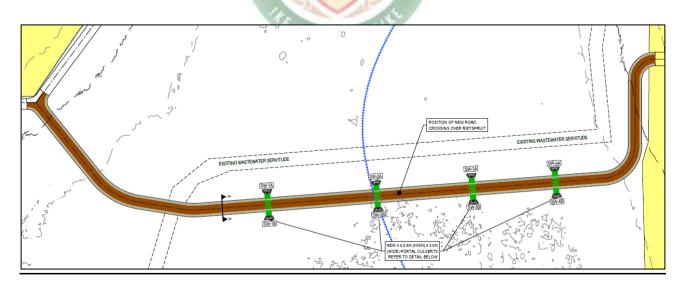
Location of portal culverts along the road crossing the Rietspruit River.
